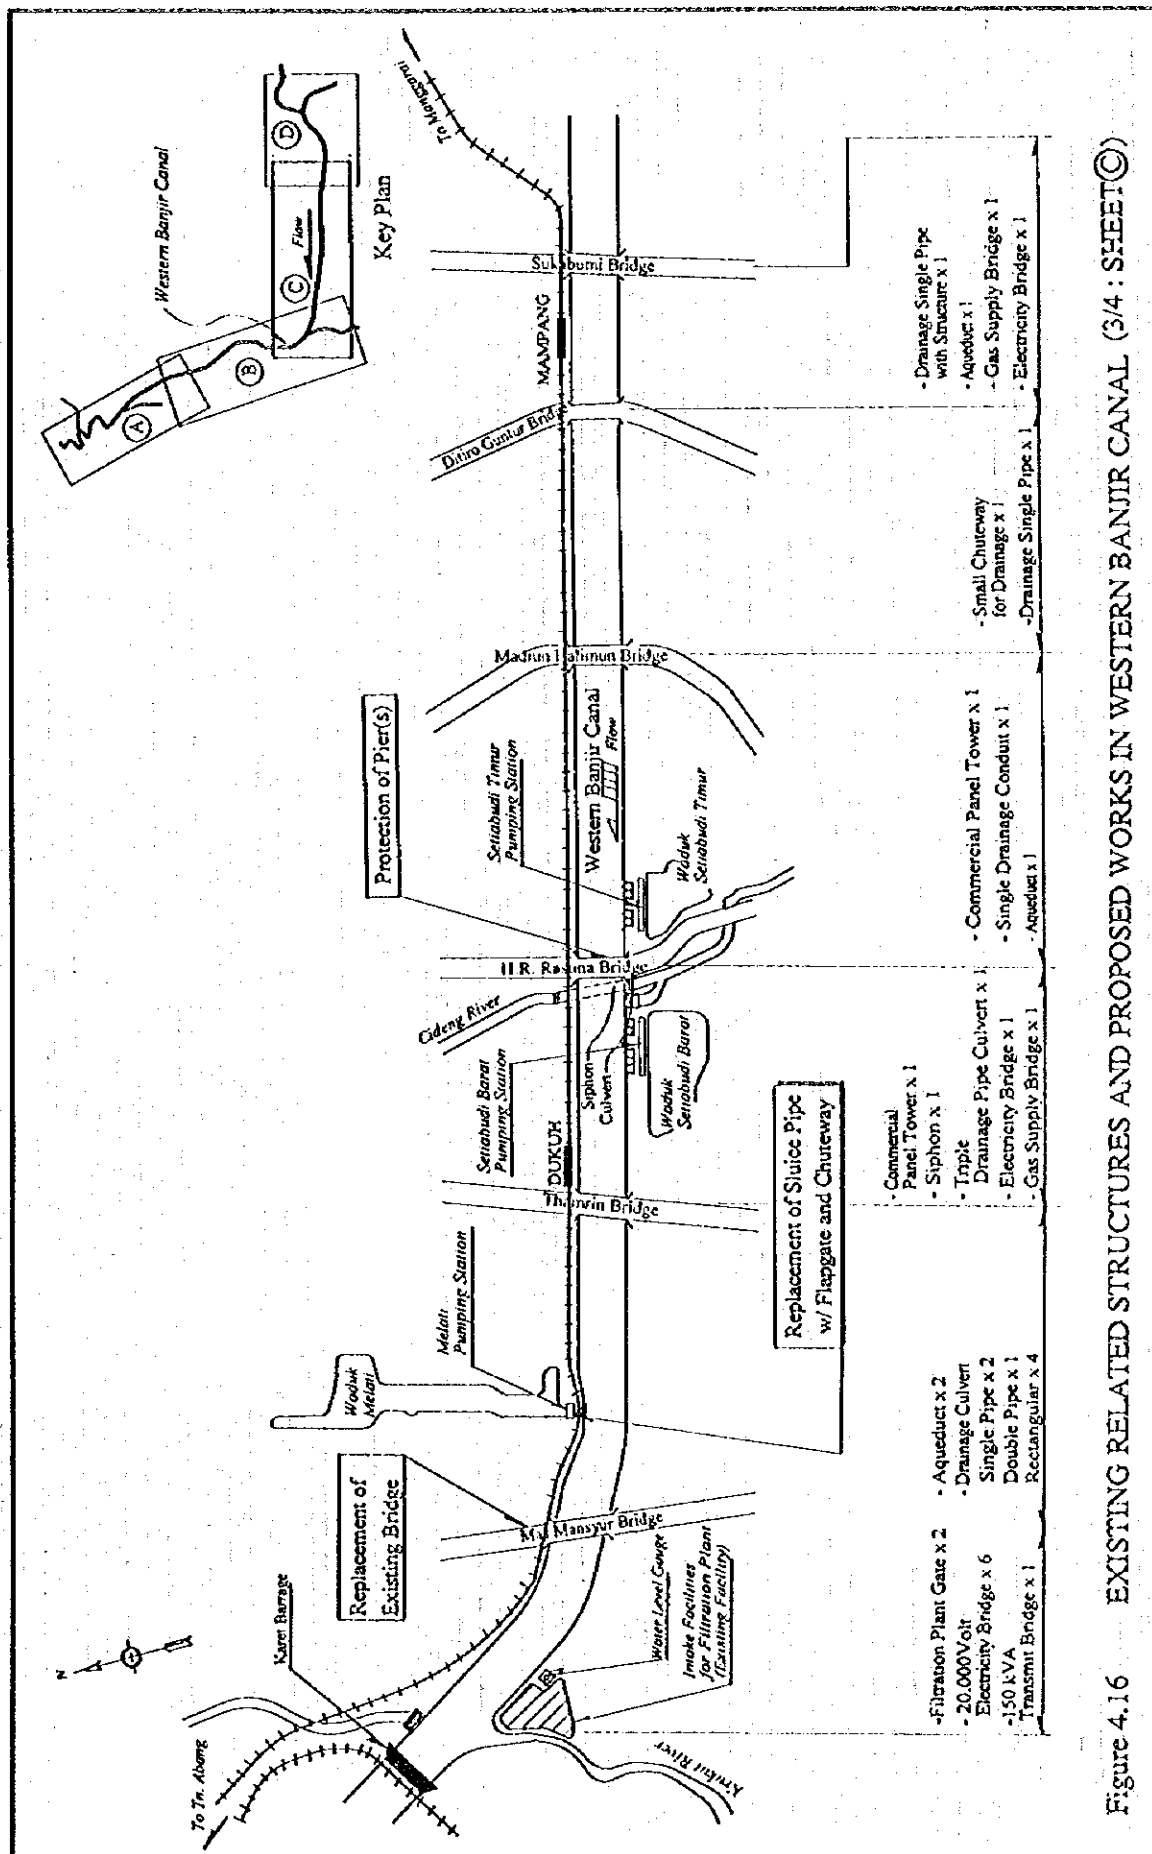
EXISTING RELATED STRUCTURES AND PROPOSED WORKS IN WESTERN BANJIR CANAL (3/4 : SHEET©)
